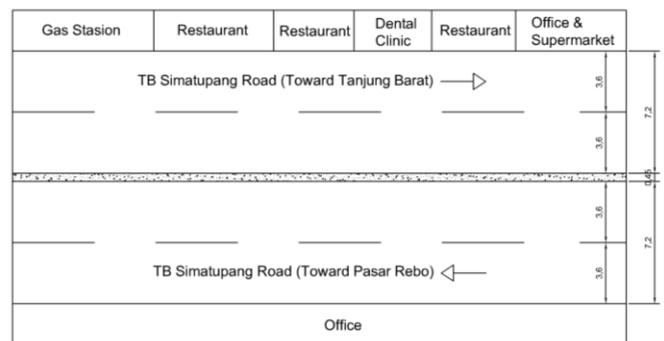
Geometric Layout – Top View of TB Simatupang Road (East)
